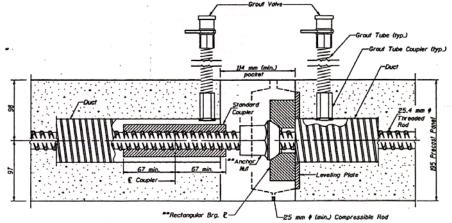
Post-tensioning detail used on Bridge-4 constructed on Route 75, Sangamon County, Illinois
